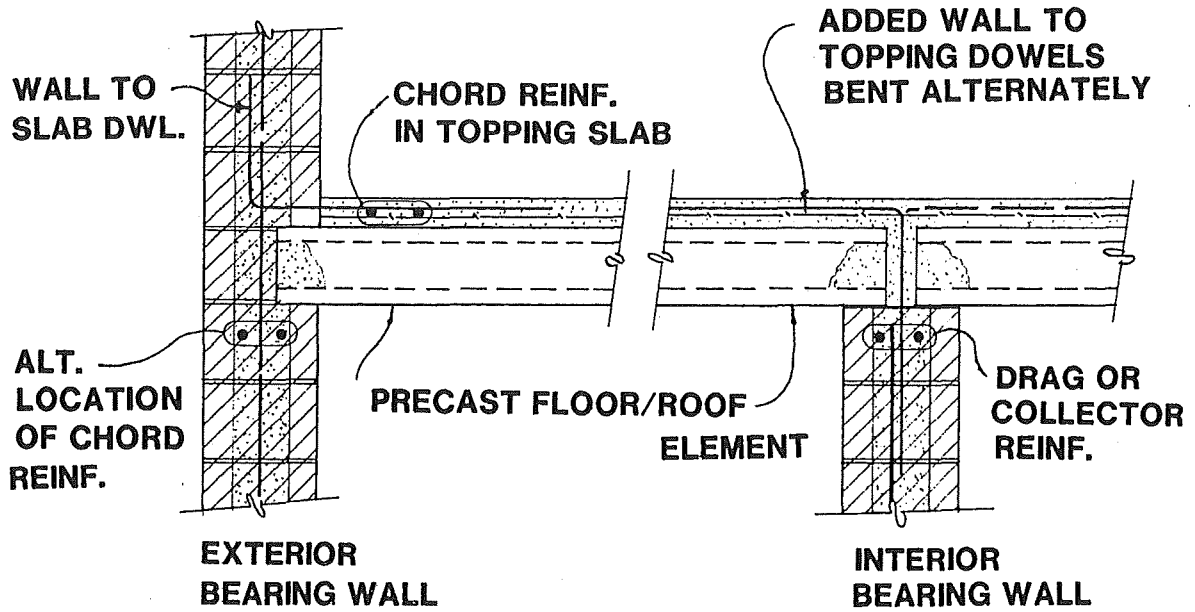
Connection of floor slab to perimeter shear (structural) wall [ATC-8, 1981]
